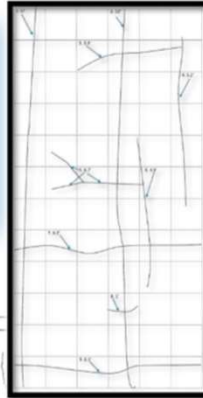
Illustration of crack mapping areas that will be used to characterize general cracking condition of the bridge deck surface
